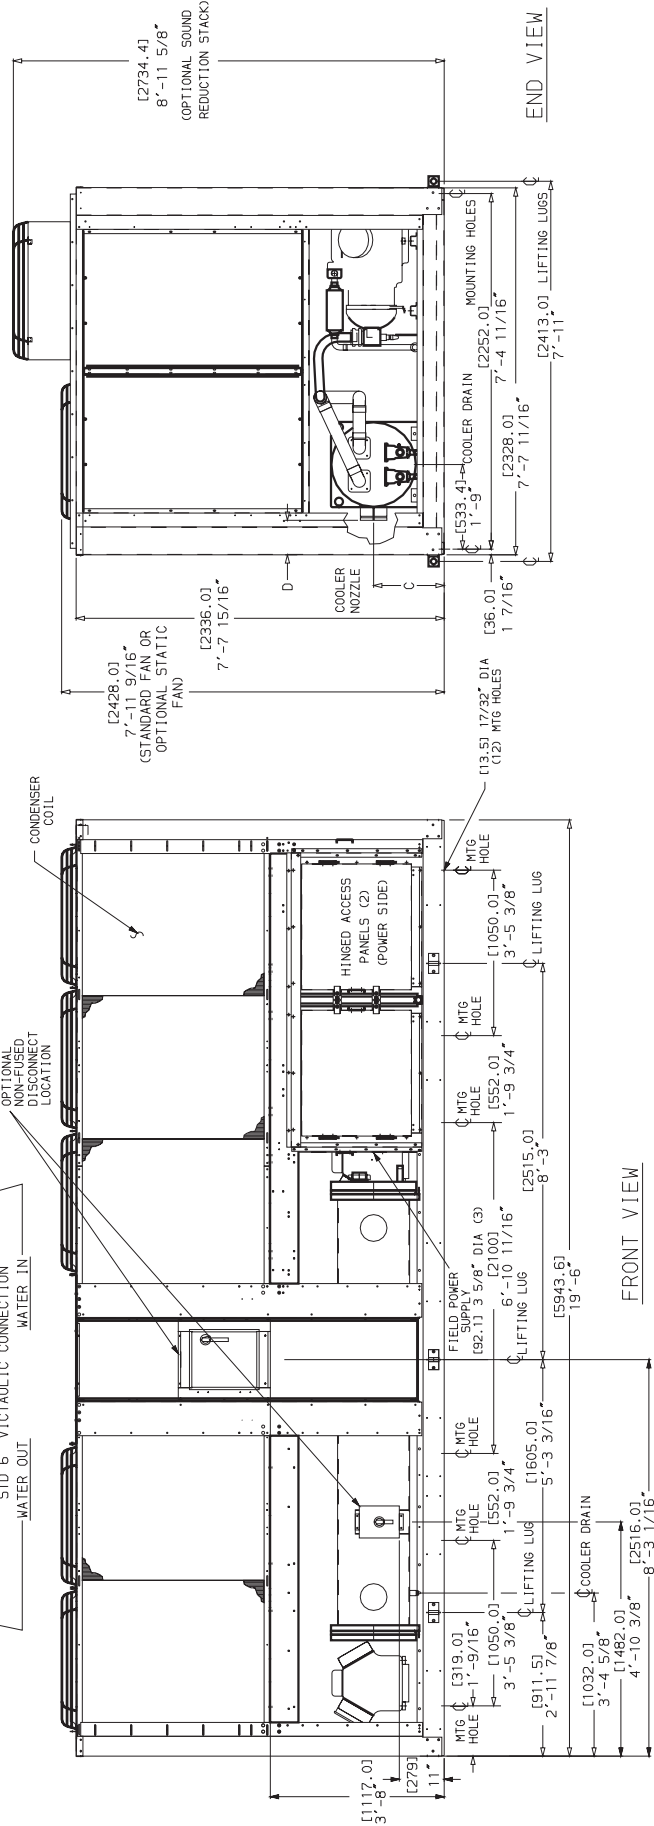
Dimensions, Unit Sizes 100,110, 225B-315B
